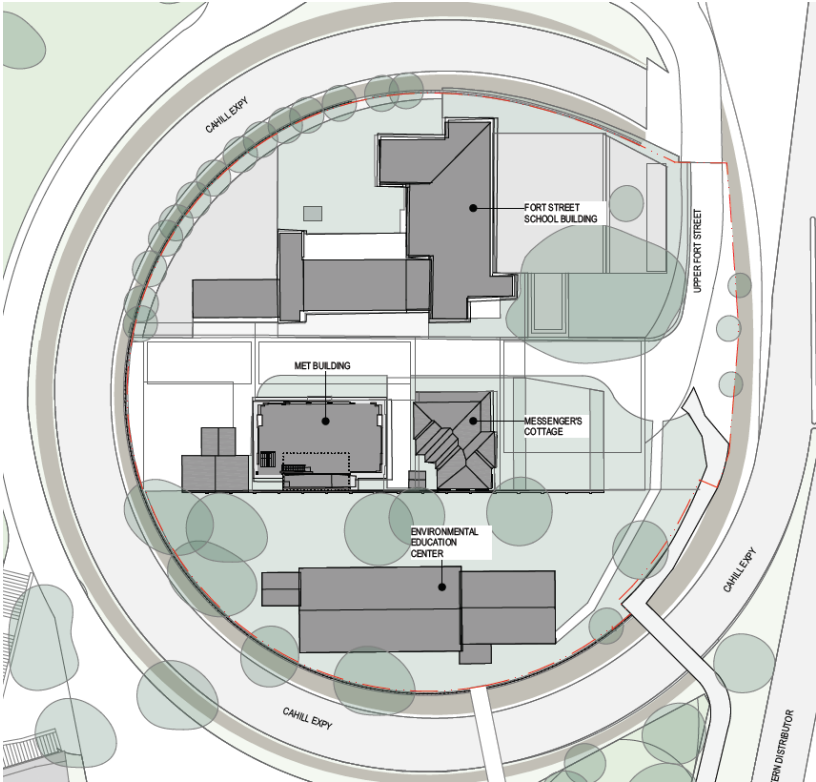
Site Plan- Existing (Source: FJMT DWG DA-1201, 18.10.19)
